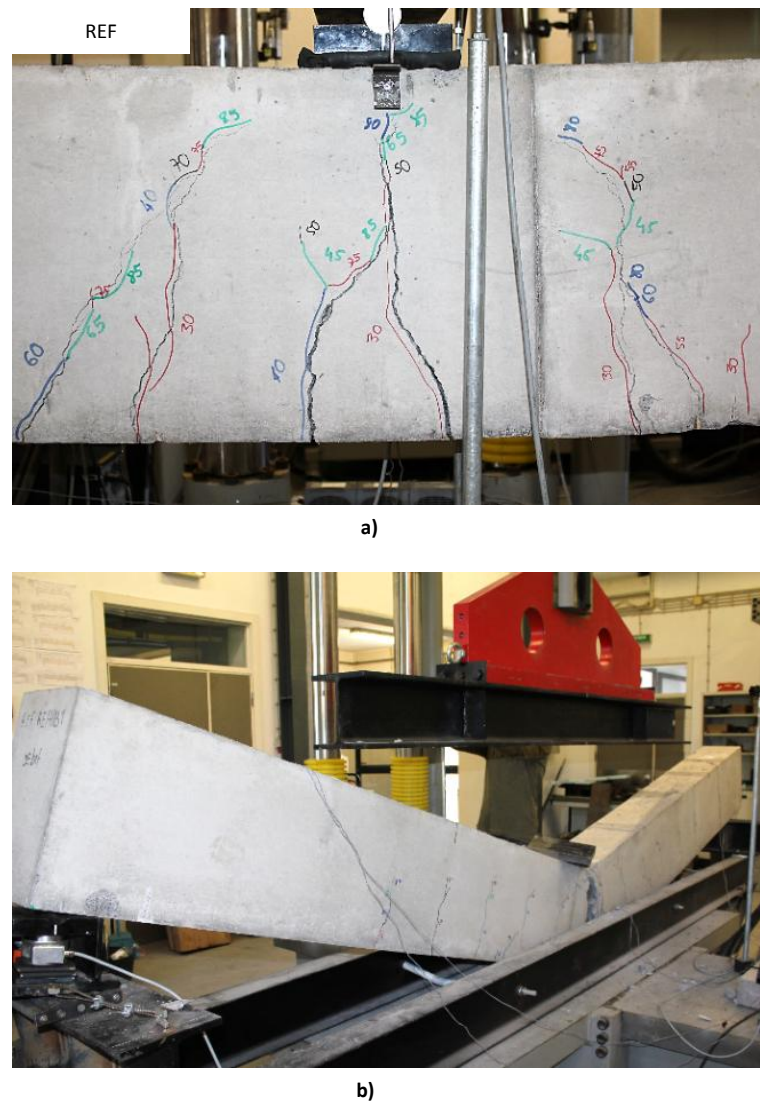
REF beam failure: a) immediately before; b) after
